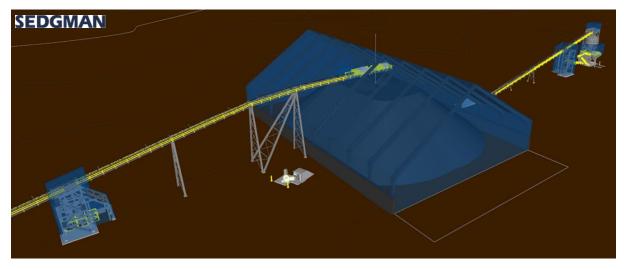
Product Coal Storage Building and Automated Truck Loadout
